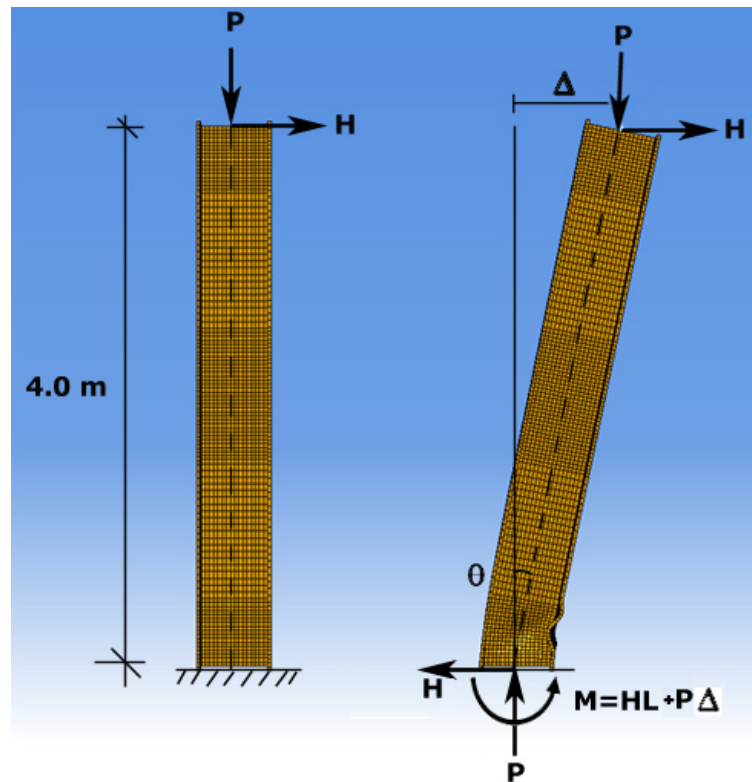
Undeformed and Deformed Fixed Cantilever Beam-Column
